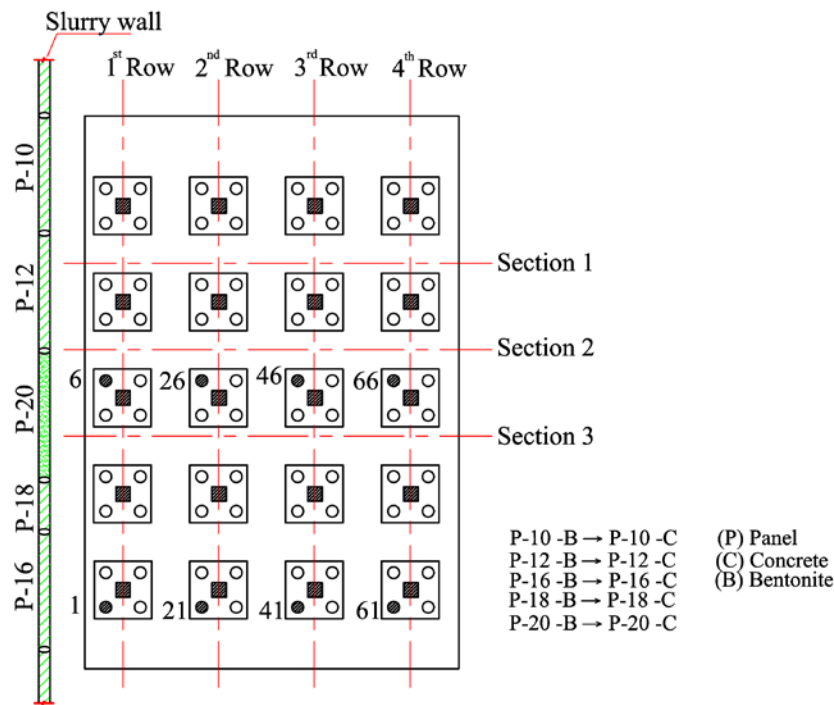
The construction stages of the panels adjacent to the studied building
